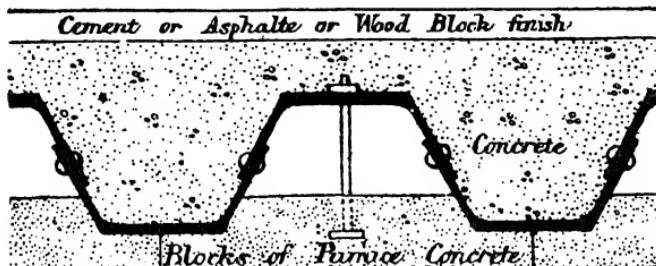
Lindsay, Neal, & Co.'s Steel-Trough Floor.
